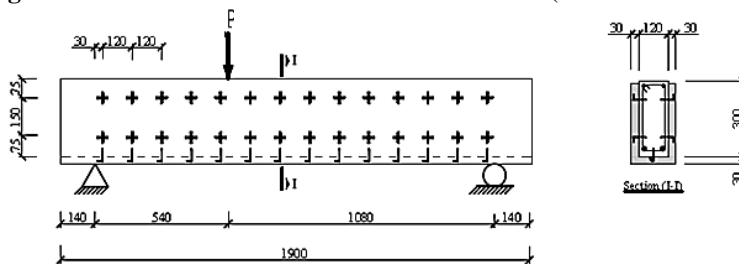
b. Beam (B1) at repairing process (Dimensions in mm).
